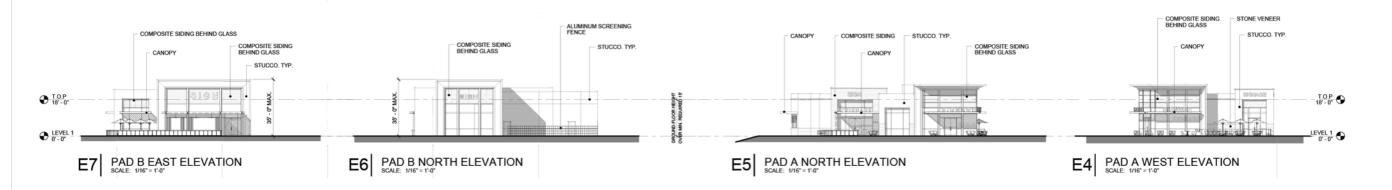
Project Elevations – Along I-15 and Retail Building Elevations
